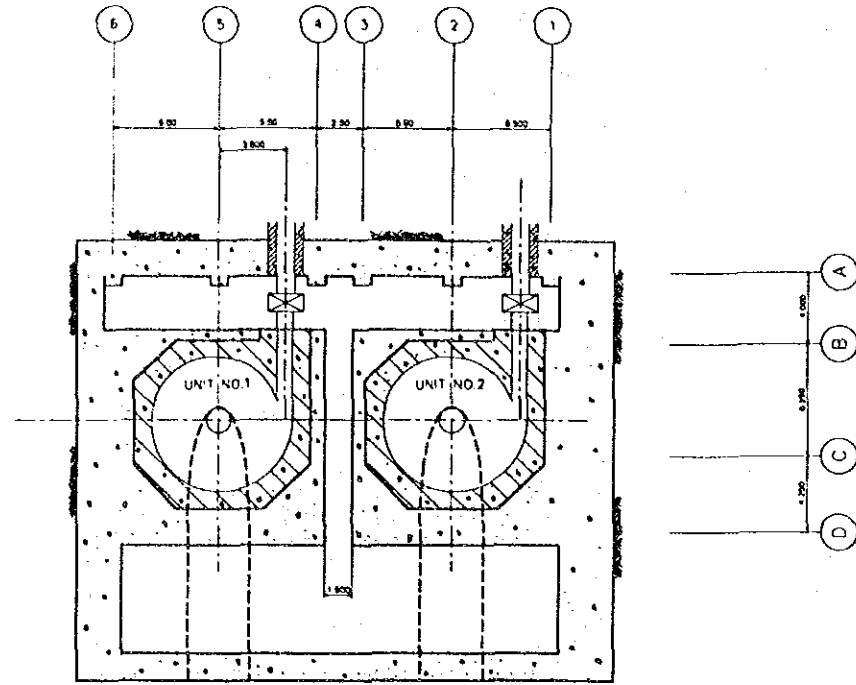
General Plan at the Intake Site of SR-3 Scheme
